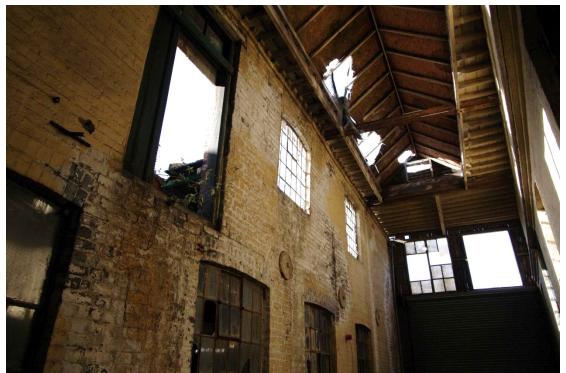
Building Q north-east facing elevation Looking north-west. Roller shutters to Coleshill Road on right
